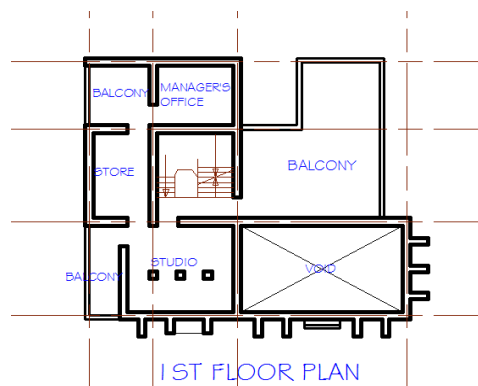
First-floor plan of the *Gidan Dan-Hausa* residential section, source: authors fieldwork
